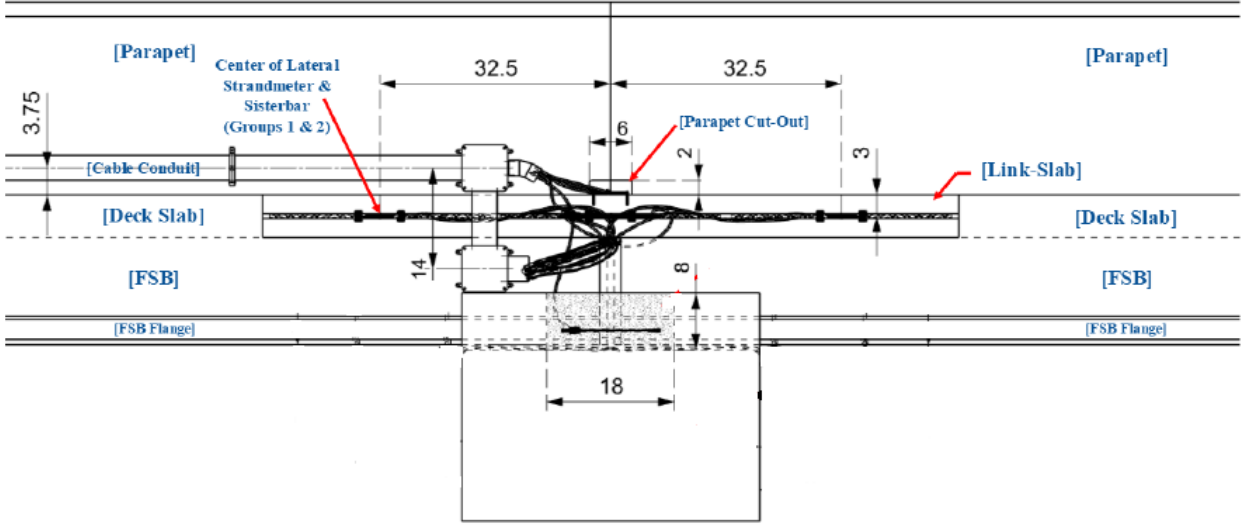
Drawing, Bridge Side View No.2 (Detail of Link-Slab)
